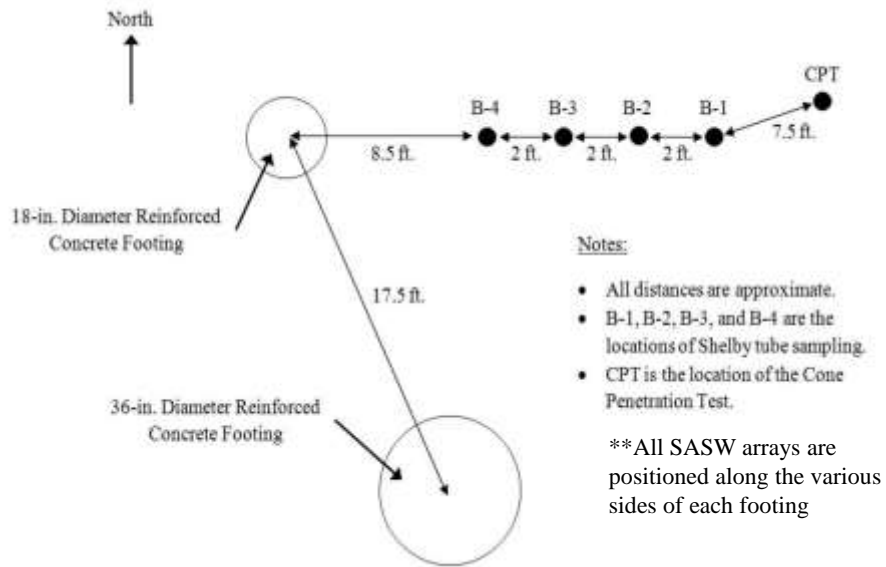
Plan view of the layout of the project site (from Van Pelt, 2010)
